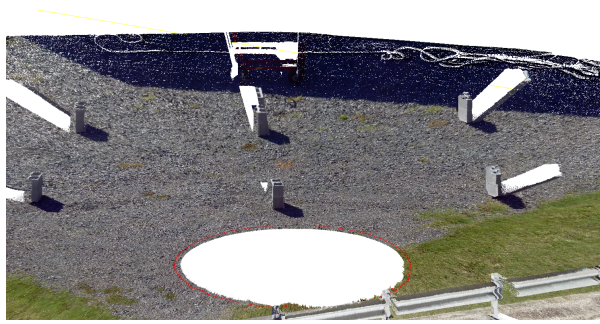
A portion of the full-dome scan of the site with mockup pier foundations.
